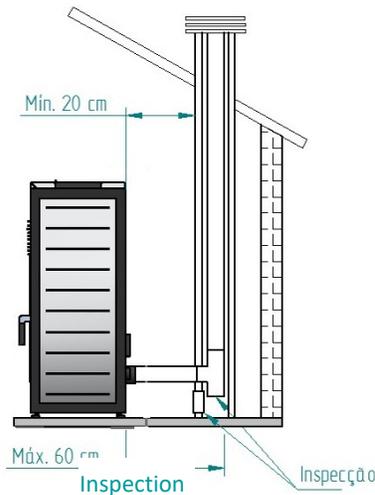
Side view of the installation with a chimney, showing the inspection point
